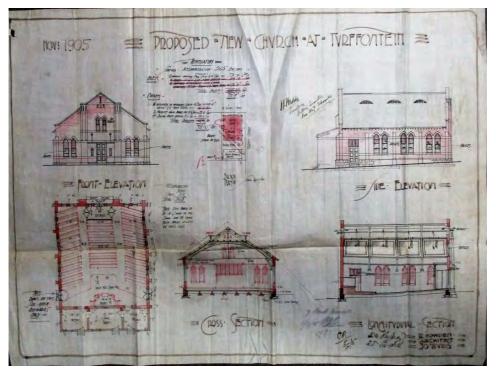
Original plan for Congregational Church from 1907 (Source: City Council of Johannesburg, Plans Archive)
